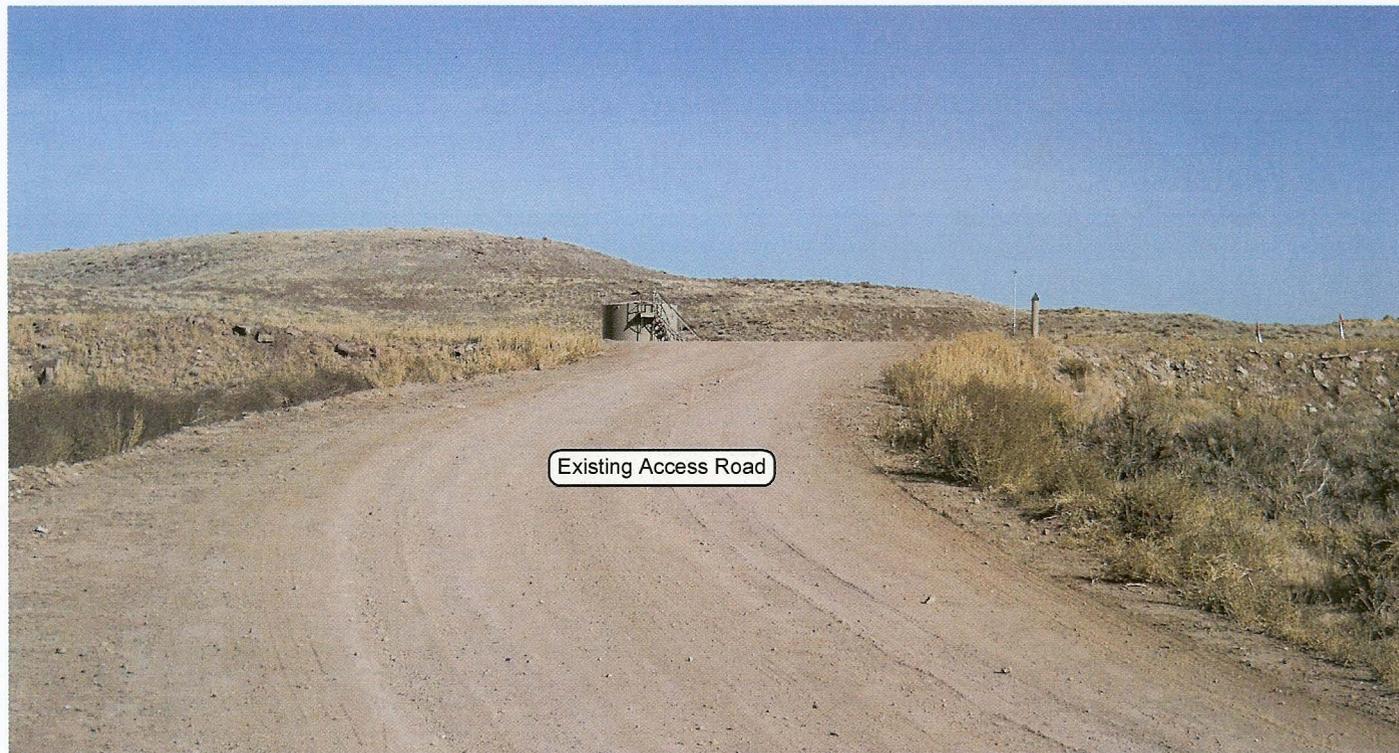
PHOTO VIEW: FROM EXISTING ROAD CAMERA ANGLE: NORTHEASTERLY
